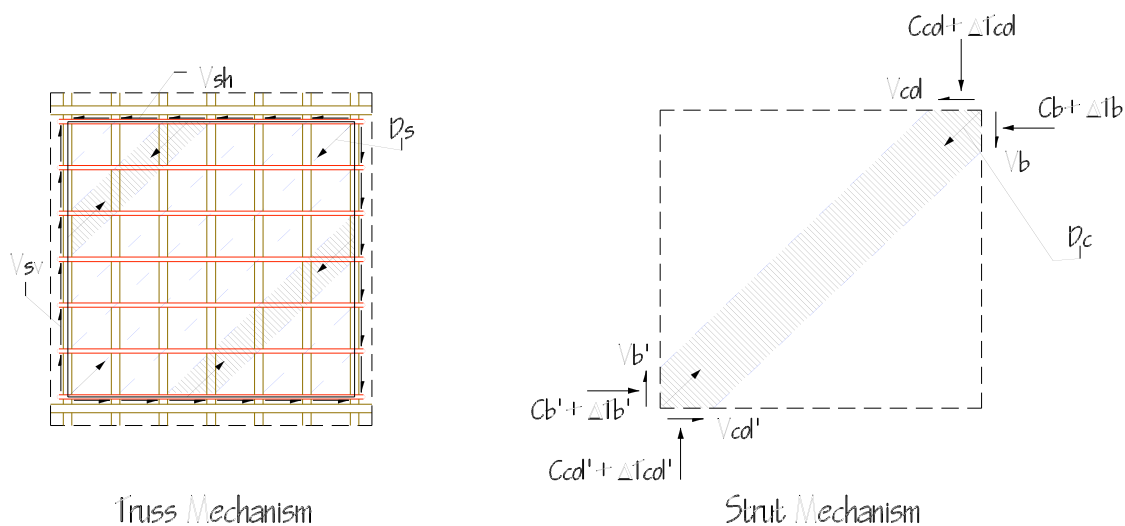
Load transfer mechanisms of adequately detailed RC beam-column joint [Naito et al., 2001]
